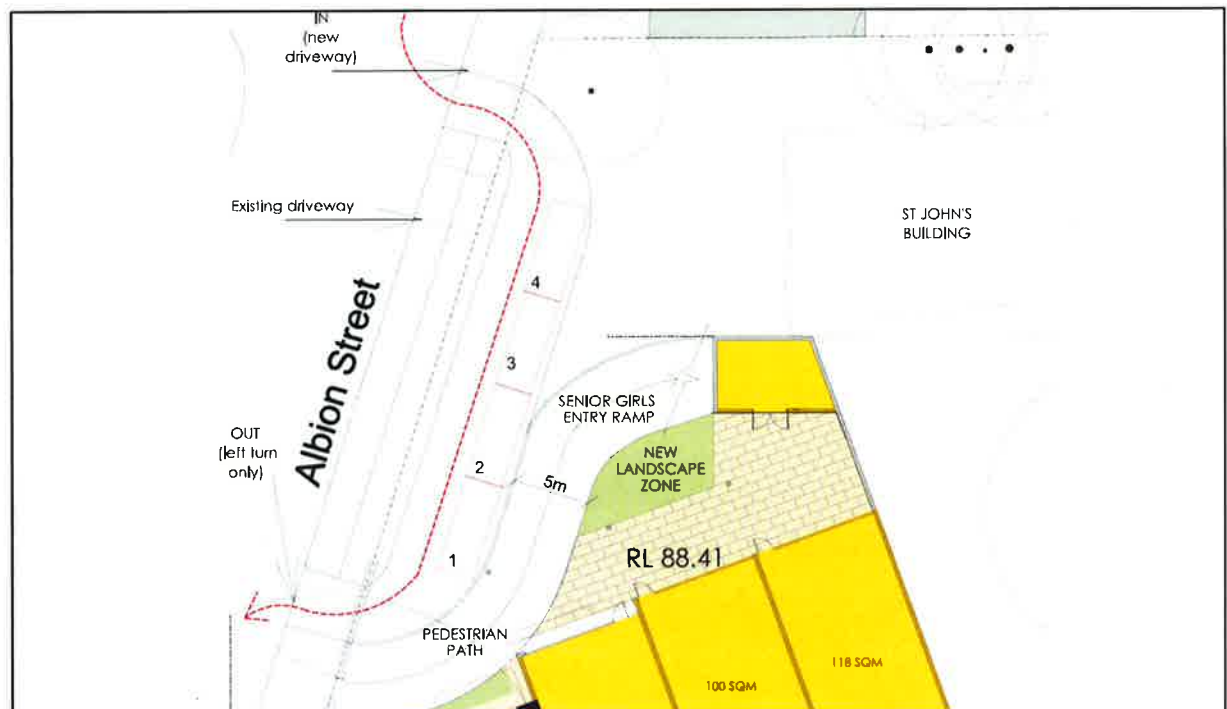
Potential on-site drop-off/pick-up zone along Albion Street
